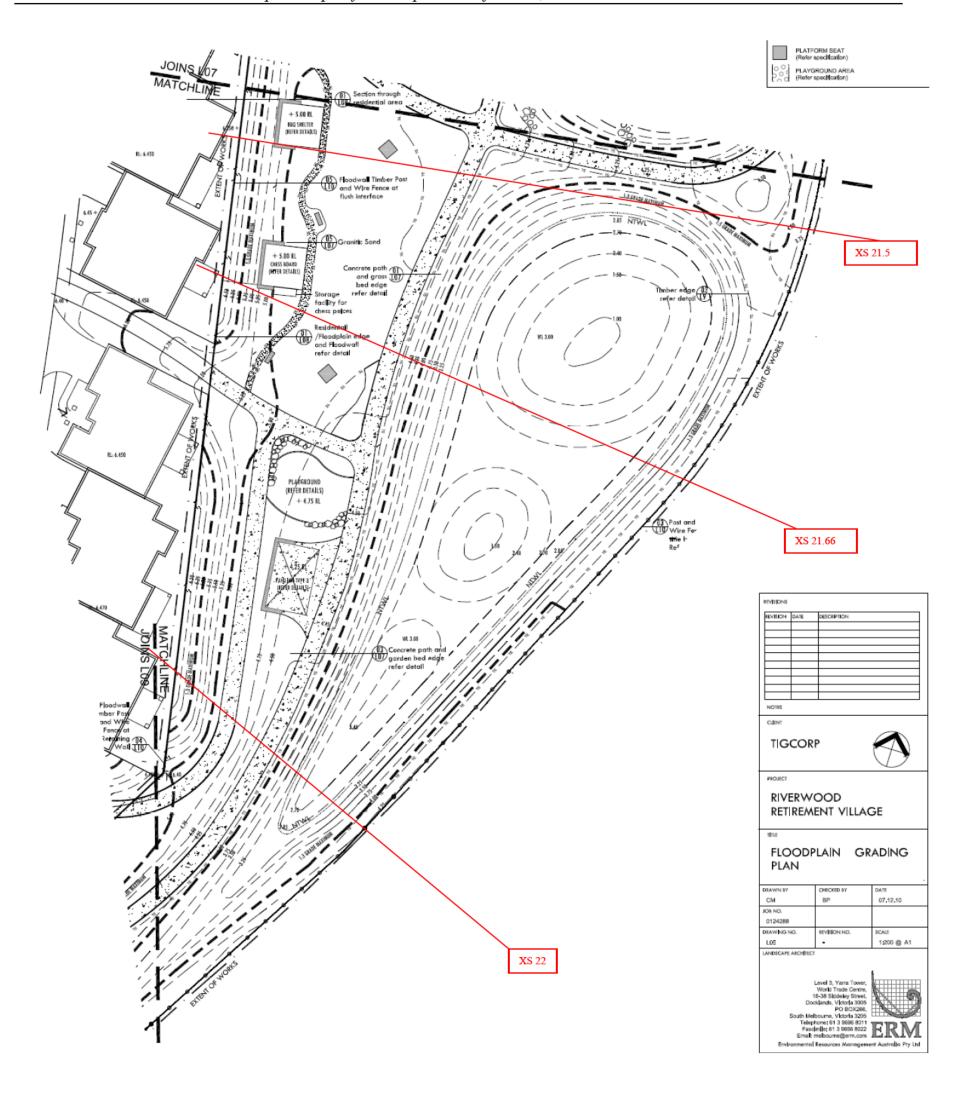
(Sheet 2 of 3) Riverwood Floodplain Grading Plan, Dec 2010 (ERM)
